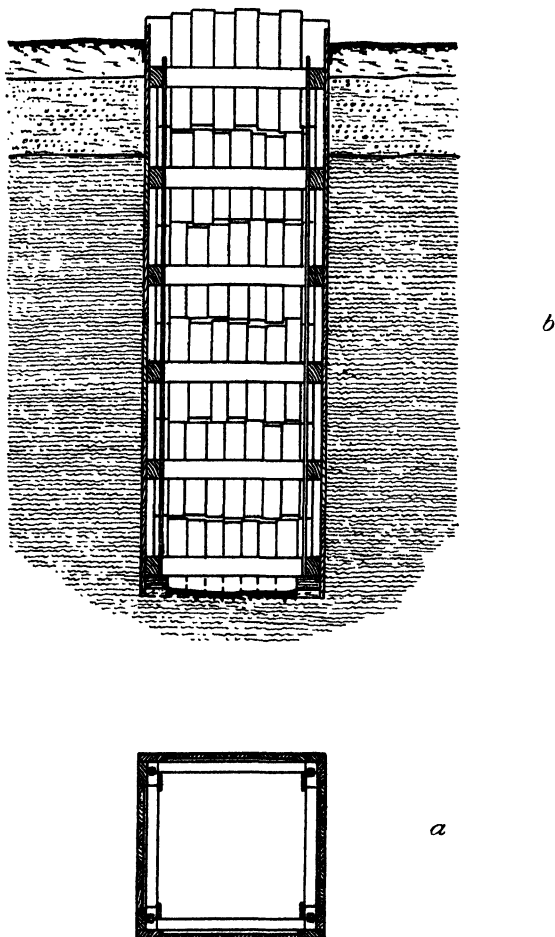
Test Pit, with Poling Boards. (a) Plan. (b) Section.
